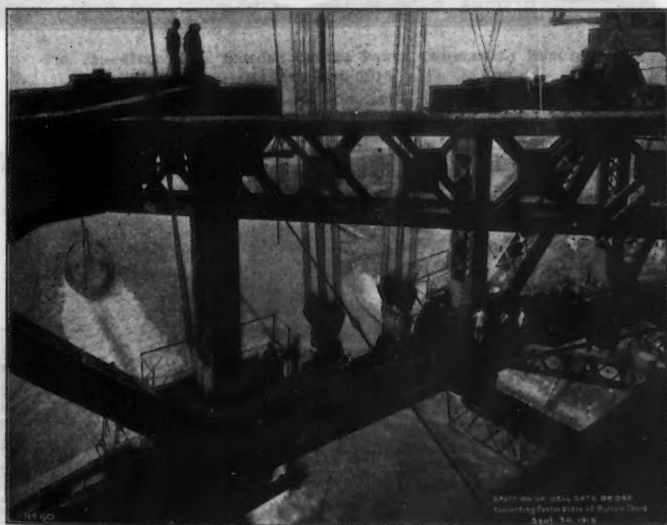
CONNECTING CENTER PANEL OF BOTTOM CHORD, SEPTEMBER 30TH, 1915, HELL GATE BRIDGE.
